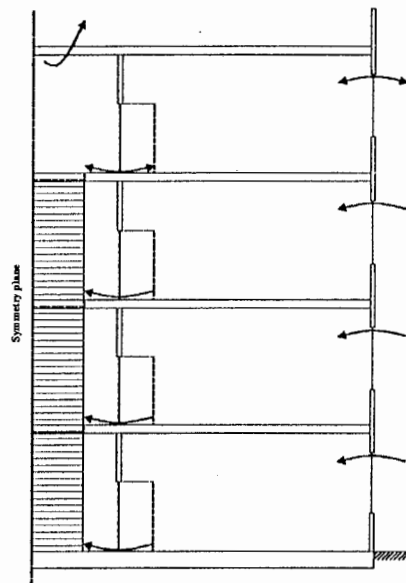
Cross section of the building and the air flow paths for natural ventilation
